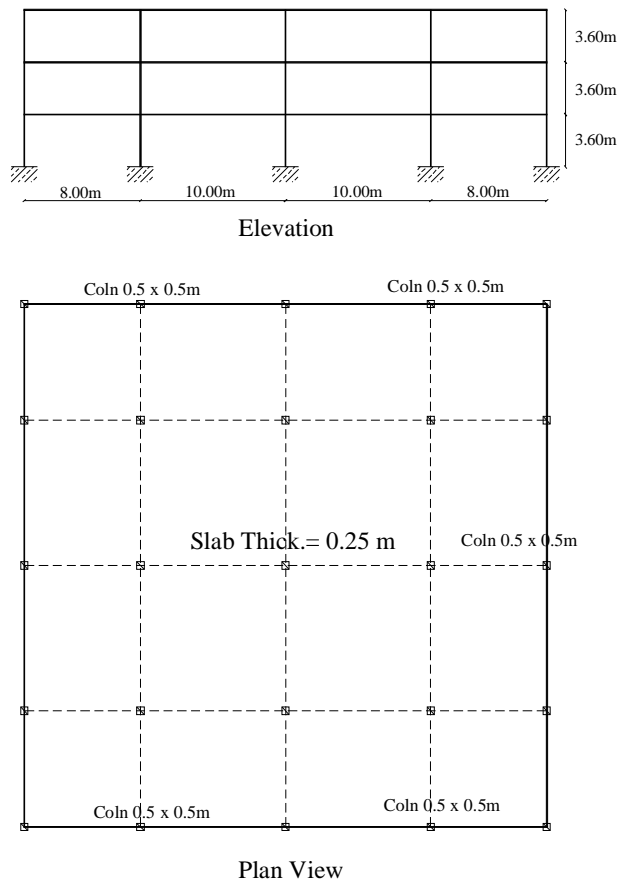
The Three Dimensional Building Layout, Examples 1 & 2.
